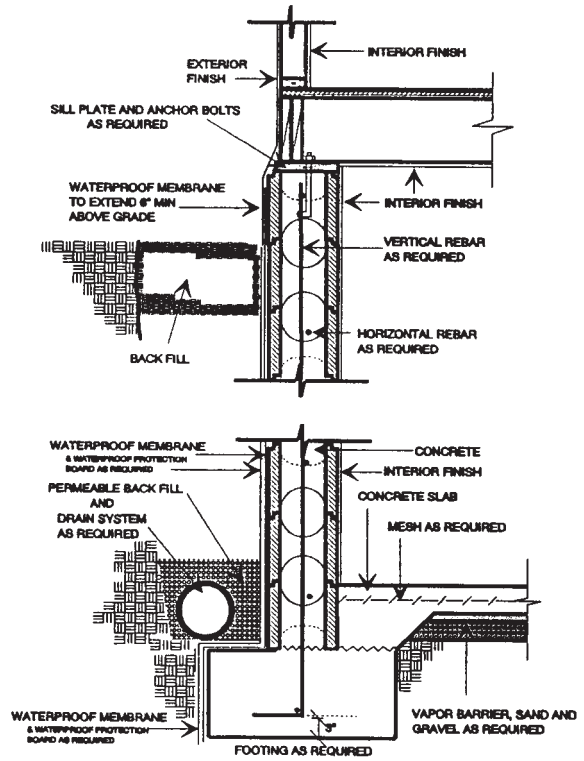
SF SERIES FOUNDATION WALL (CONCRETE WALL CONSTRUCTION)
